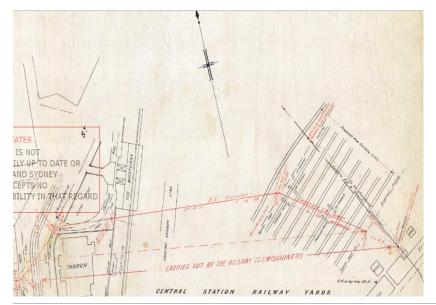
1924 detail from sewerage diagram, showing cutting of brick oviform sewer for new Central Electric development. The former brick sewer's northward section across the yard is "To be abandoned" Source: Metropolitan Board of Water Supply and Sewerage, City sewerage northern division – diversion of Council's old sewer, Day Labor [sic] 2077 Sheet 1, 1924, Sydney Water Plans, DL2077 (1)
